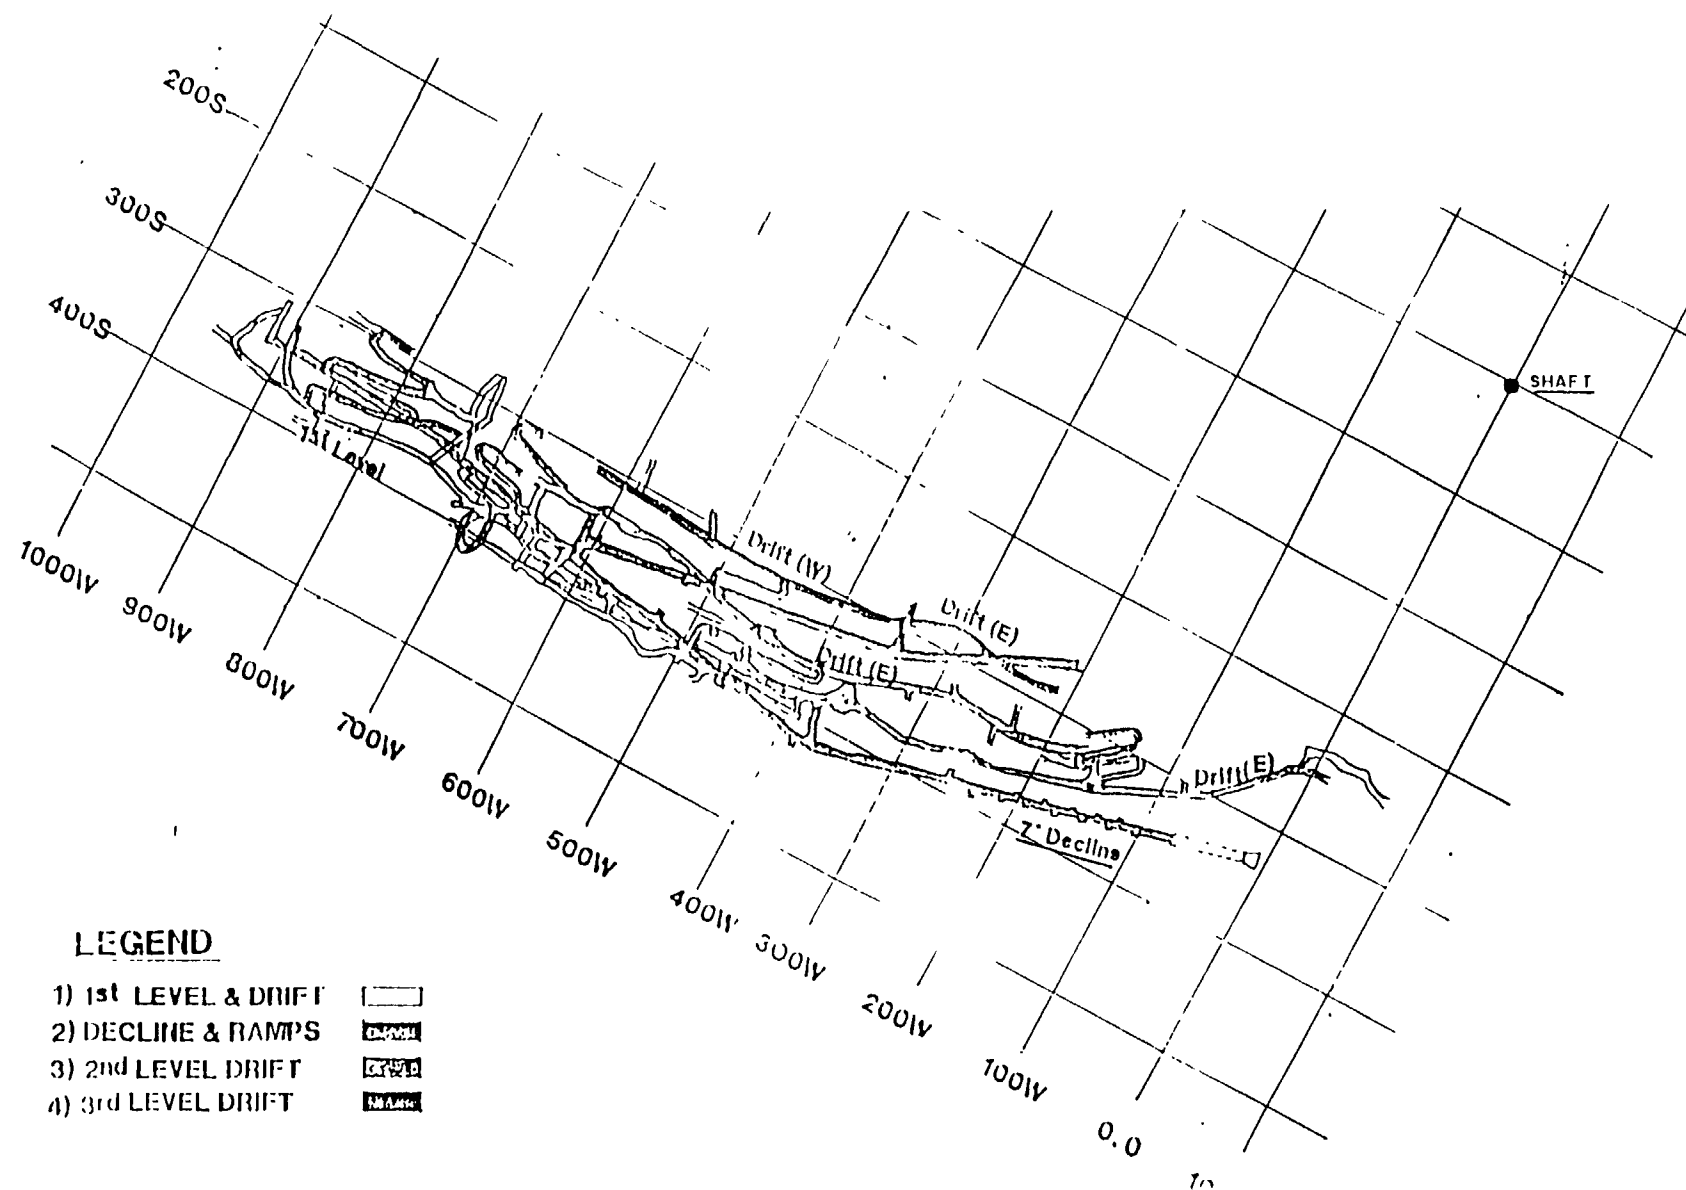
Narwapahar mining project; underground plan showing present development through decline.
